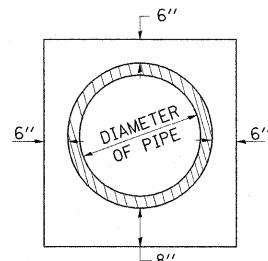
DETAILS OF CONCRETE COLLAR PIPE TO PIPE
